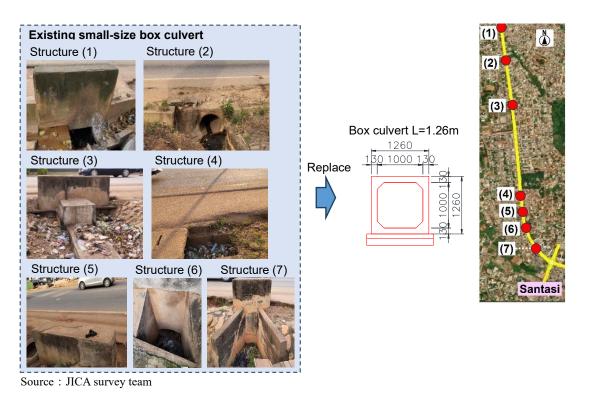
Structure (1)~(7): Box Culverts L=1.26m
